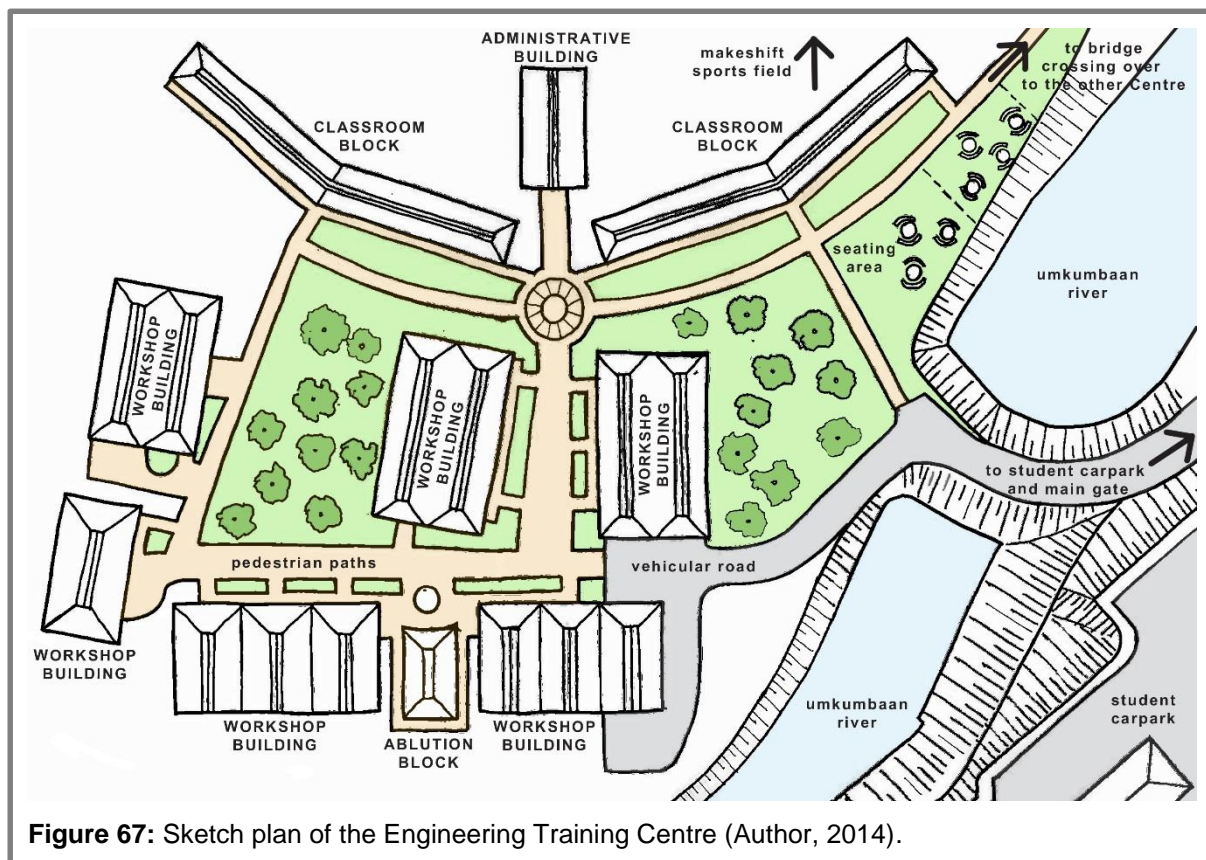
Sketch plan of the Engineering Training Centre (Author, 2014).
